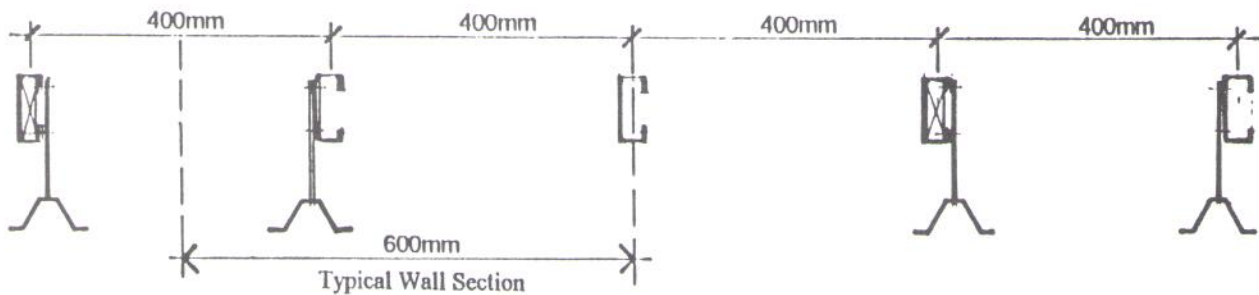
Horizontal Spacing of Shear Connectors Attached to the Flanges of the Steel Studs
